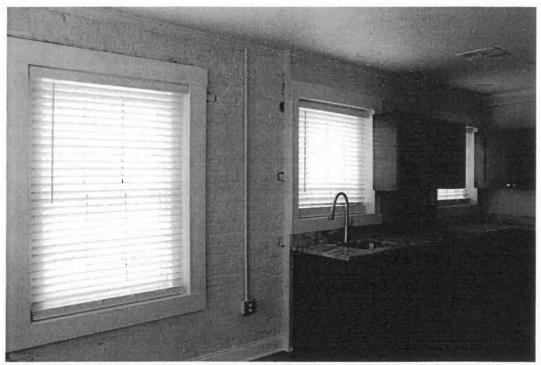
Missing plaster and new sheet rock, repaired trim, third floor southern unit, looking northwest
